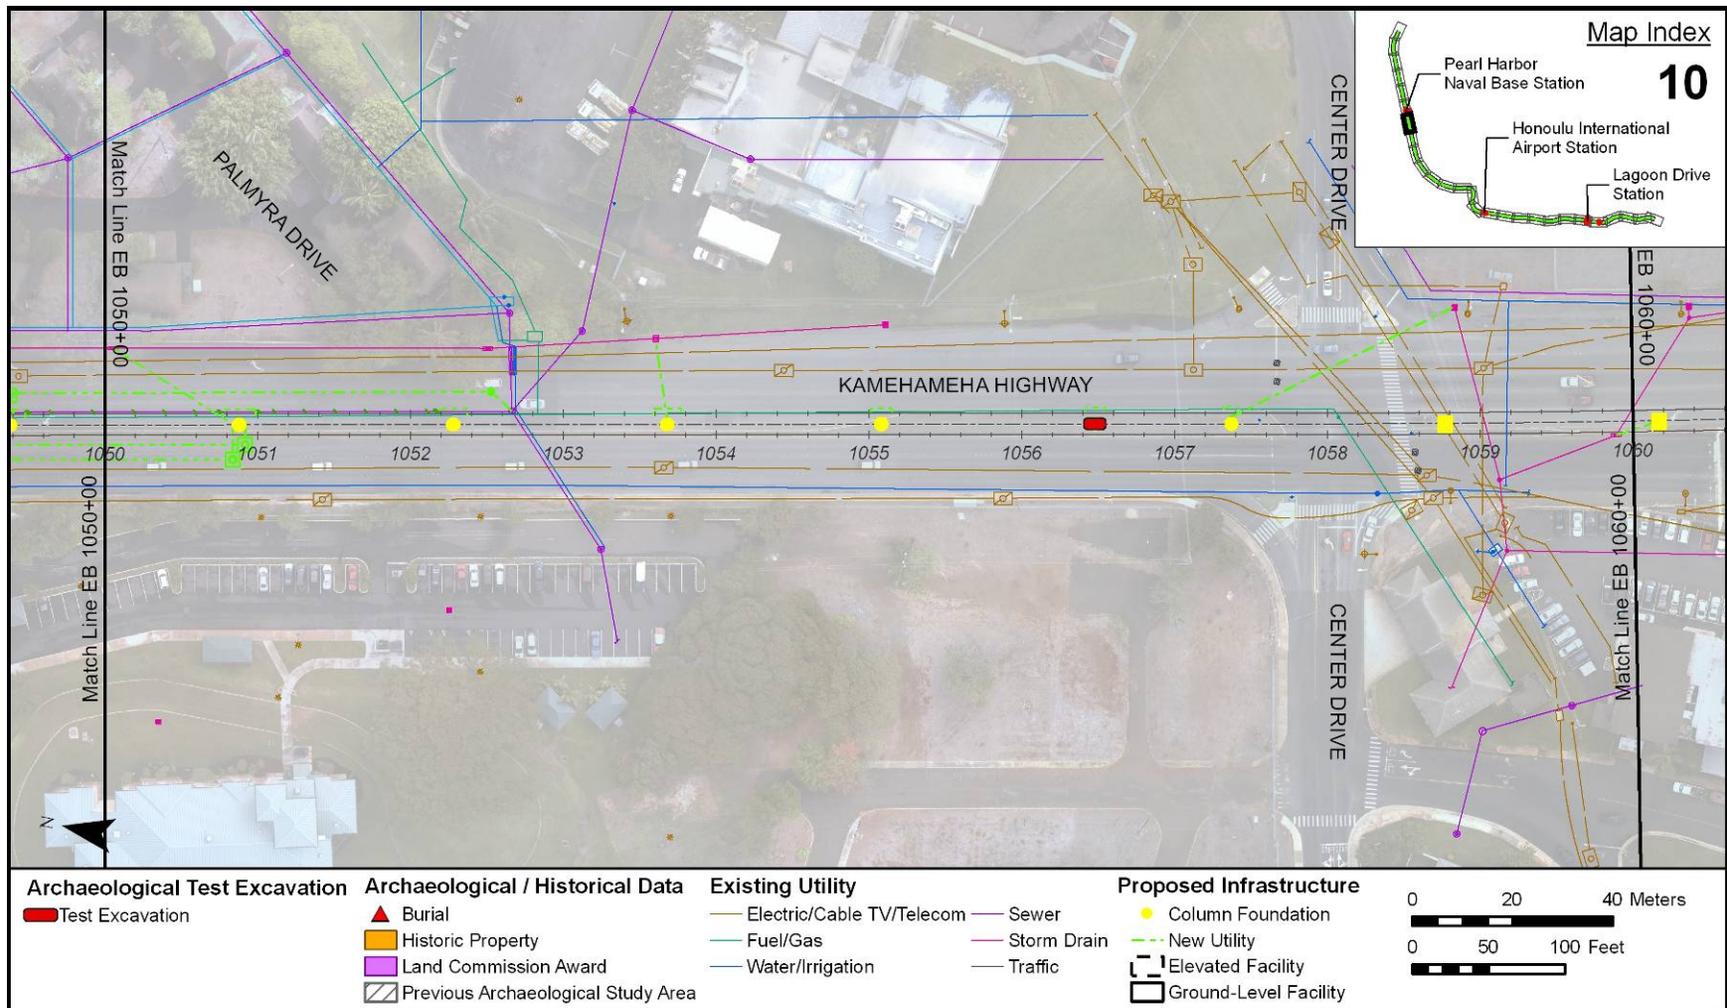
Map Sheet J 10 (near Center Drive), one 10x3 excavation at column foundation @ 1056+50
